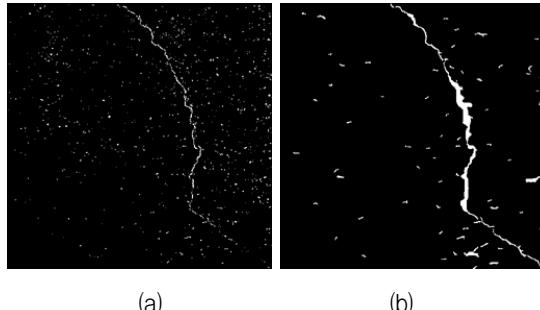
Extracted crack images from Crack2. (a) Existing method [4], (b) Proposed method
